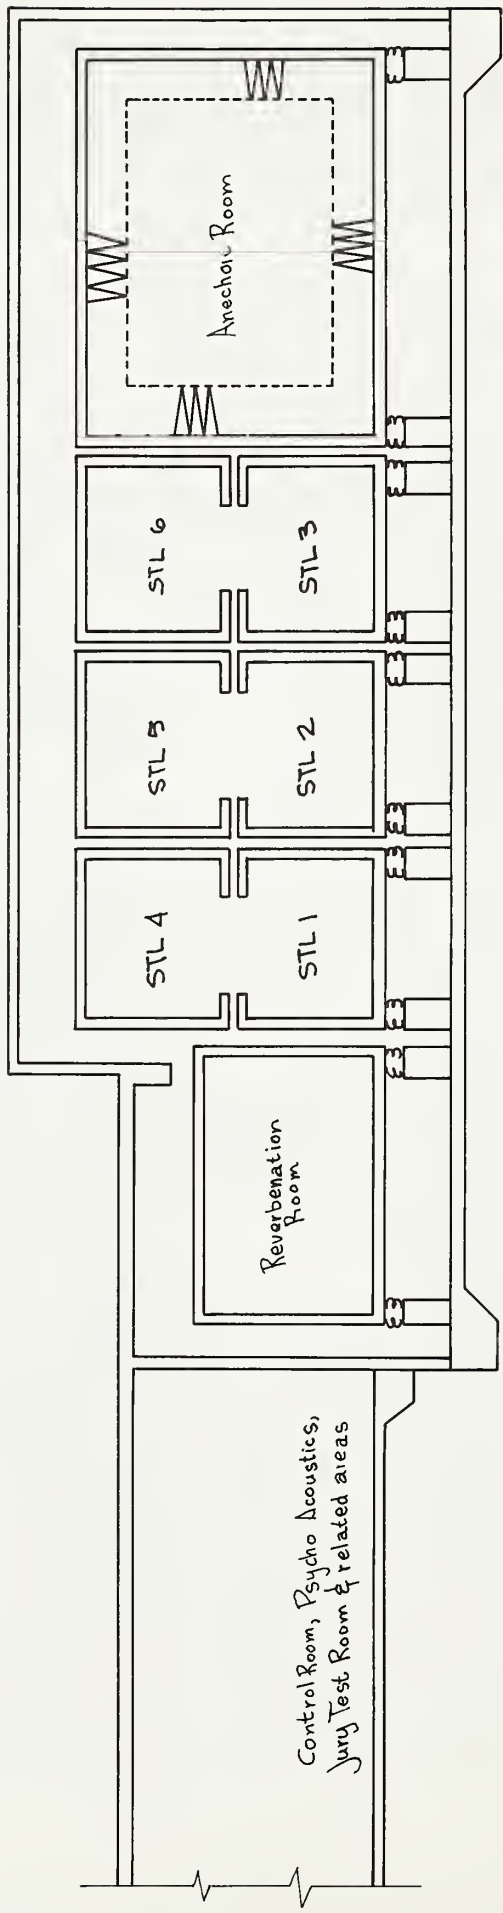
SECTION A-A of ACOUSTIC TESTING FACILITIES
